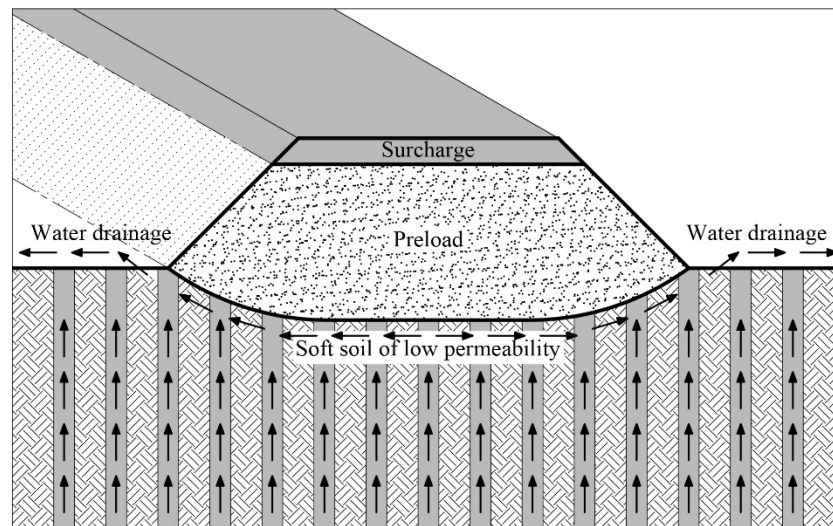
Vertical drains used with preloading to accelerate consolidation
